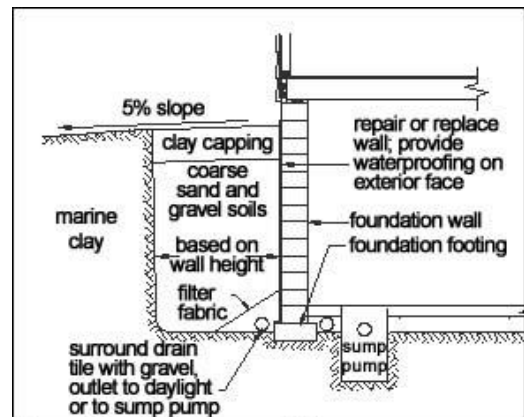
Repair or replacement of a damaged foundation wall
